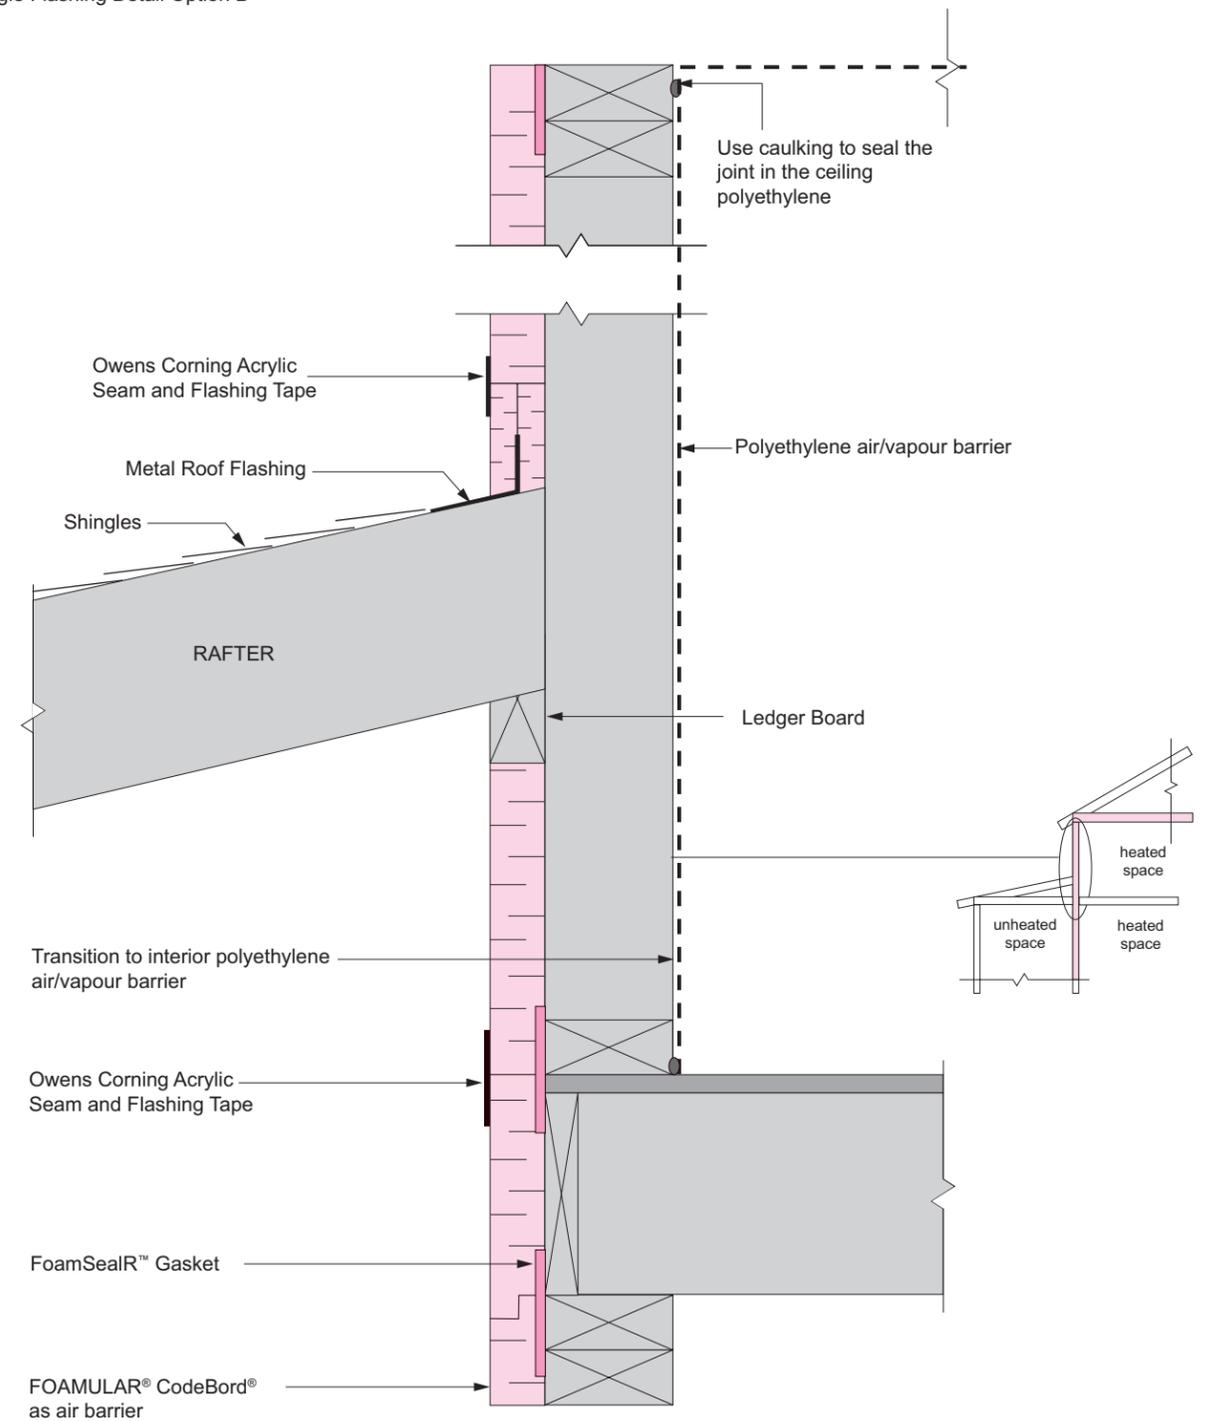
Exterior Walls Projecting Past Attached Structure (Shingle Flashing Detail Option B)
